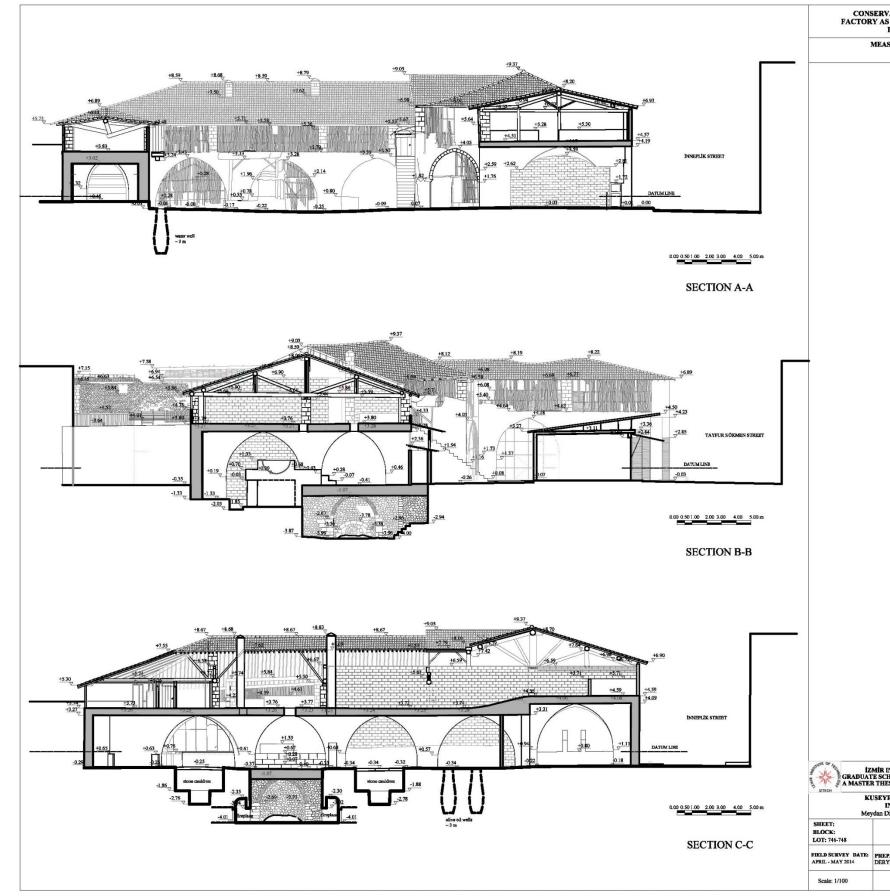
Measured drawing - Section A-A, Section B-B, Section C-C
